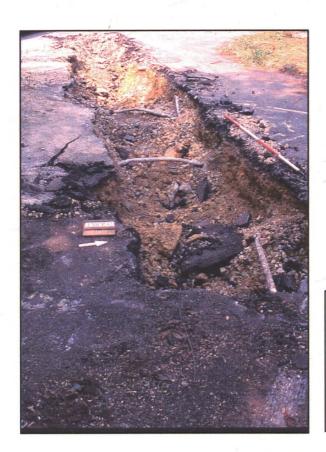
(left): General view of the trench excavated in the preferred area, looking south-west. The fuel tanks (covered with concrete) and associated pipework can be seen throughout.
